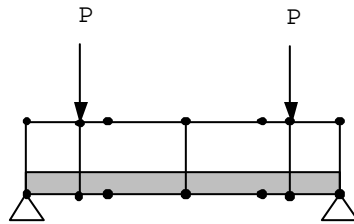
Illustration of 1-Span Bridge Chord, Rods are Frame Elements, 2-Point Load Beam Model
